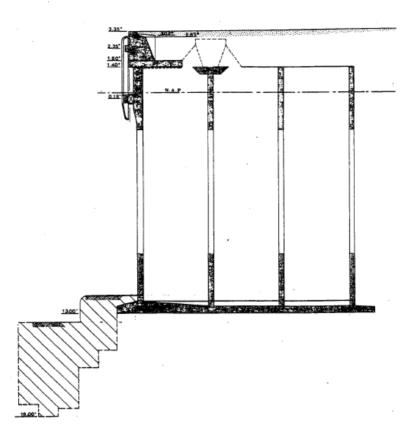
cross section Pier 6 with grout injection in front of the caisson
